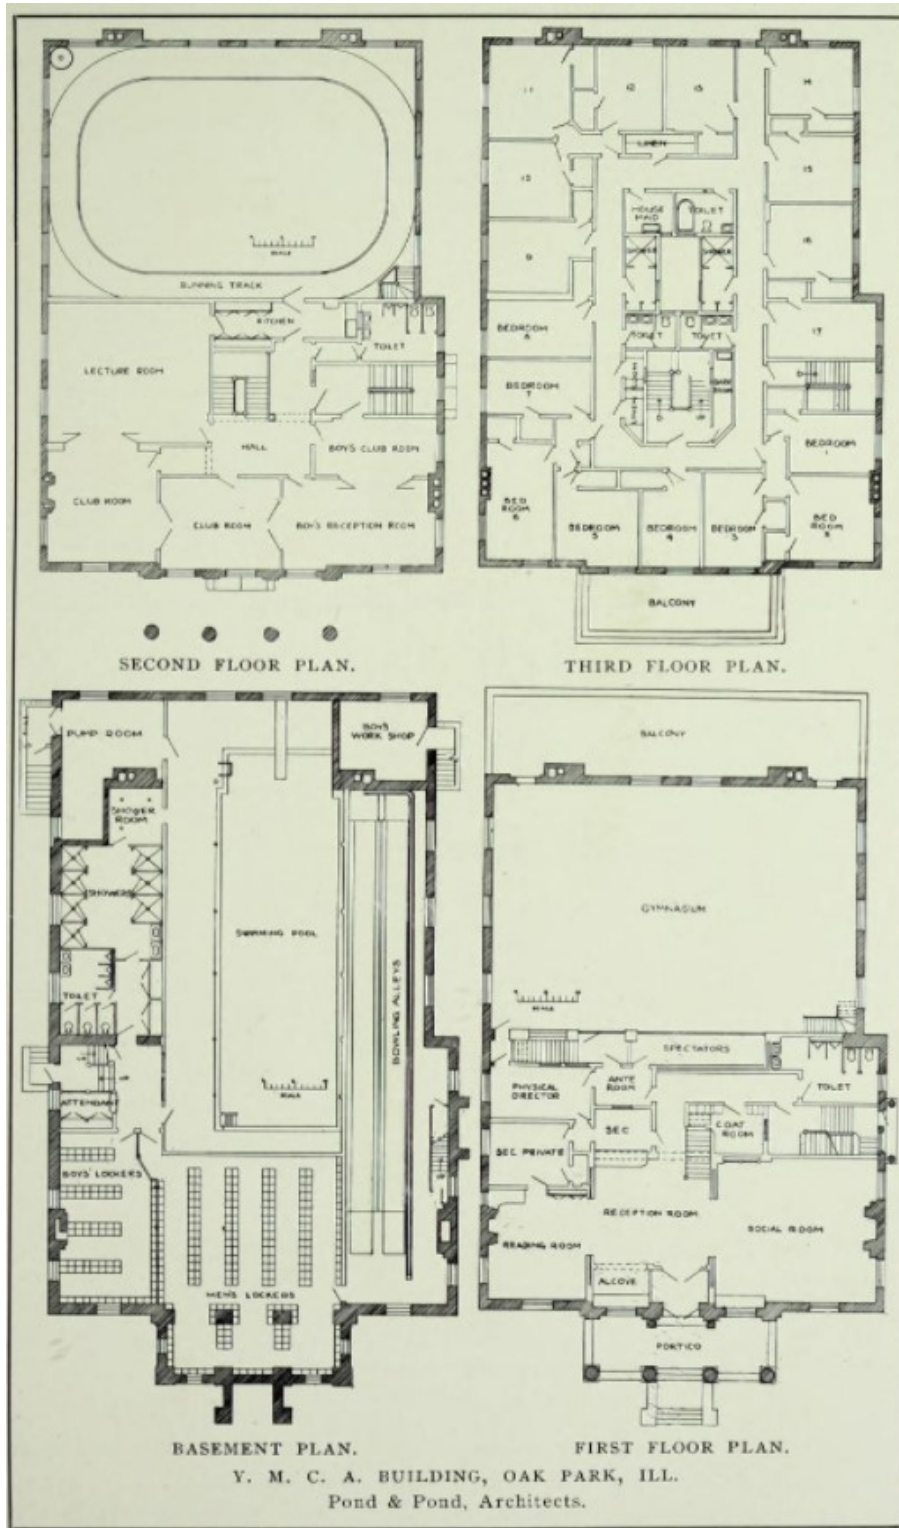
Plan drawings of the Oak Park YMCA. Source: Walter M. Wood, "Buildings of the Young Men's Christian Association," *The BrickBuilder* 14 (December 1905): 265.
